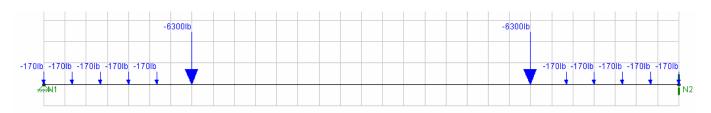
Transverse Derrick Support Beam Worst Case Loading
